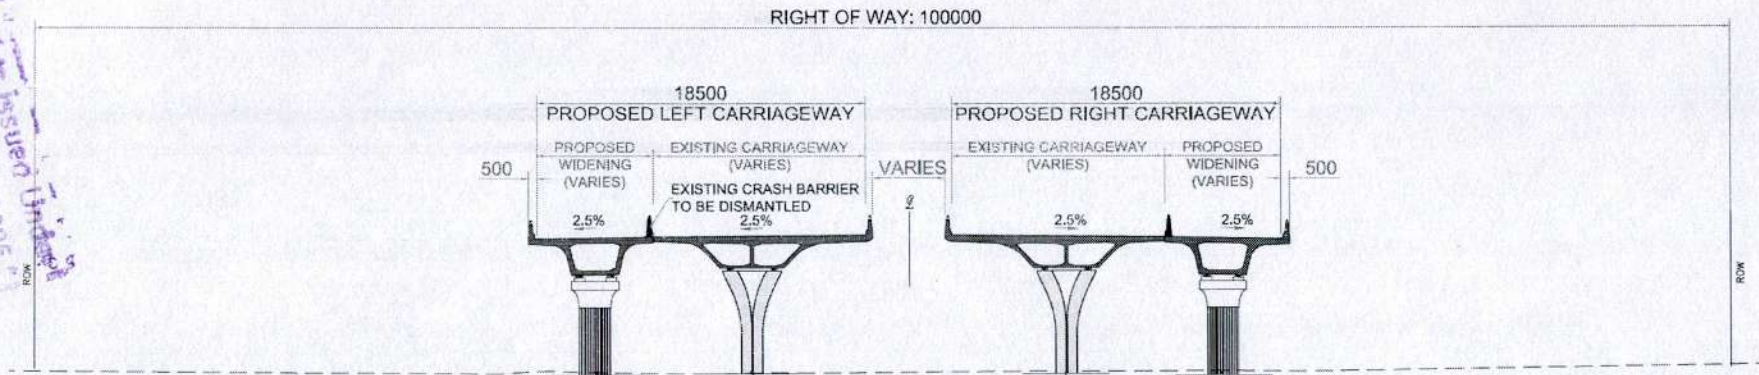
Typical Cross Section – At Tumkur Road & Hosur Road Flyover Portion
